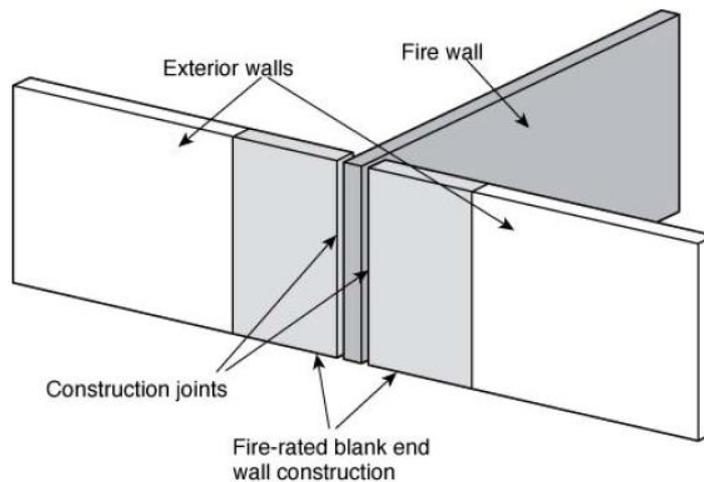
(a) End Wall Exposure Protection — End Walls Tied to Structural Framing.
